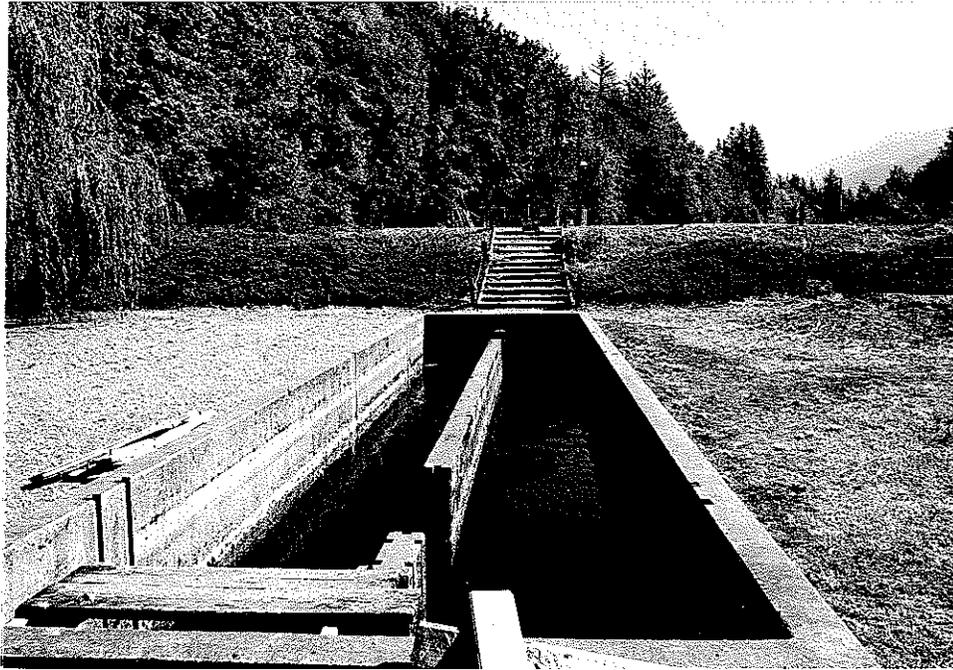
View looking east toward berm of Lower Pond. Flow in flume draining Lower Pond is toward the camera.
